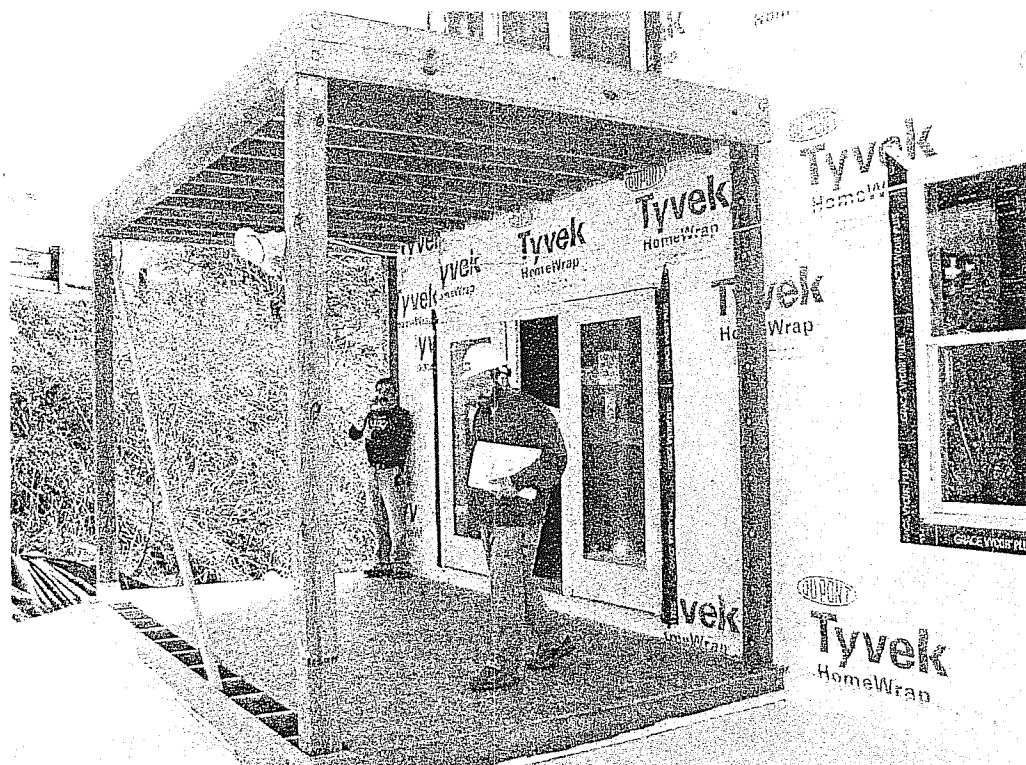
Deck above 2nd Floor roof (Post at Northwest corner was verified to be over beam support)
